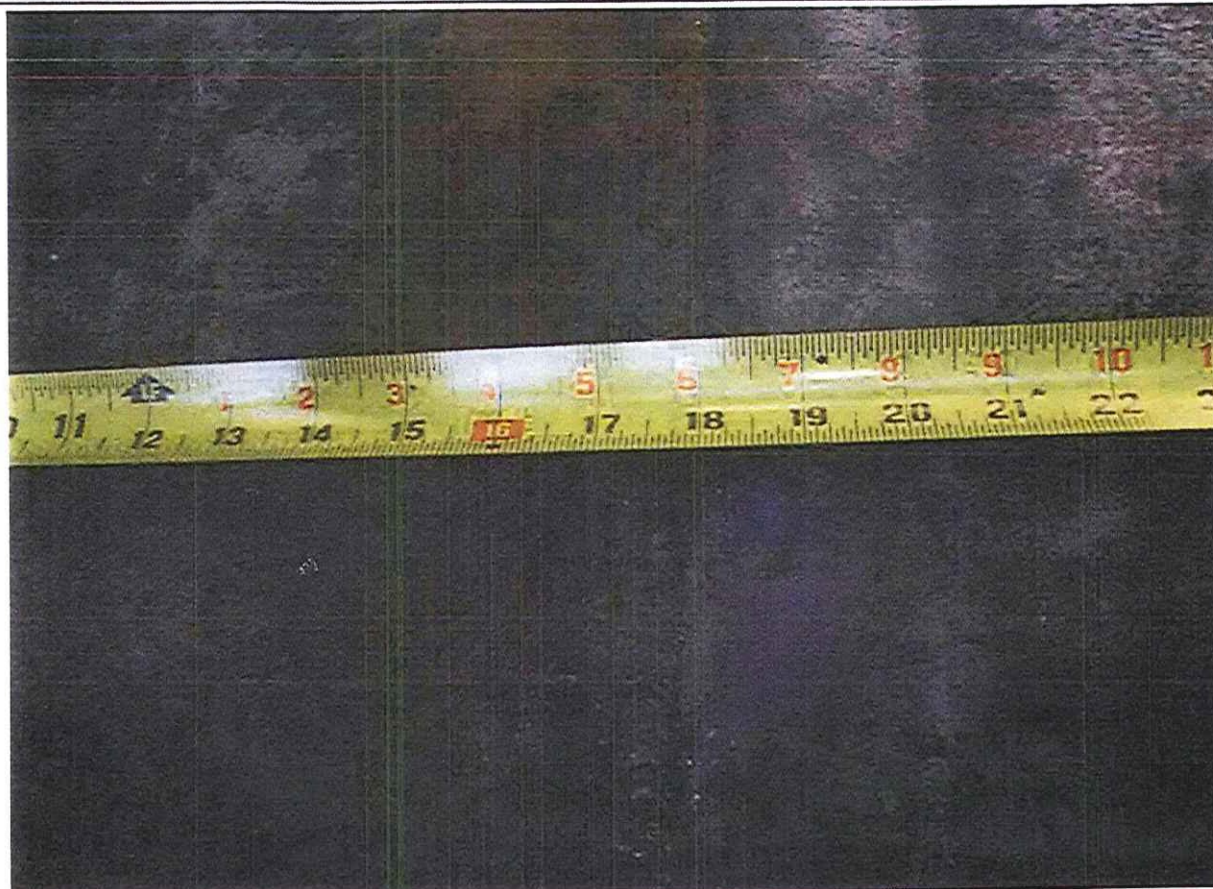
Coating Removed at Girth Weld (1' 5 1/2" from U/S Edge)
